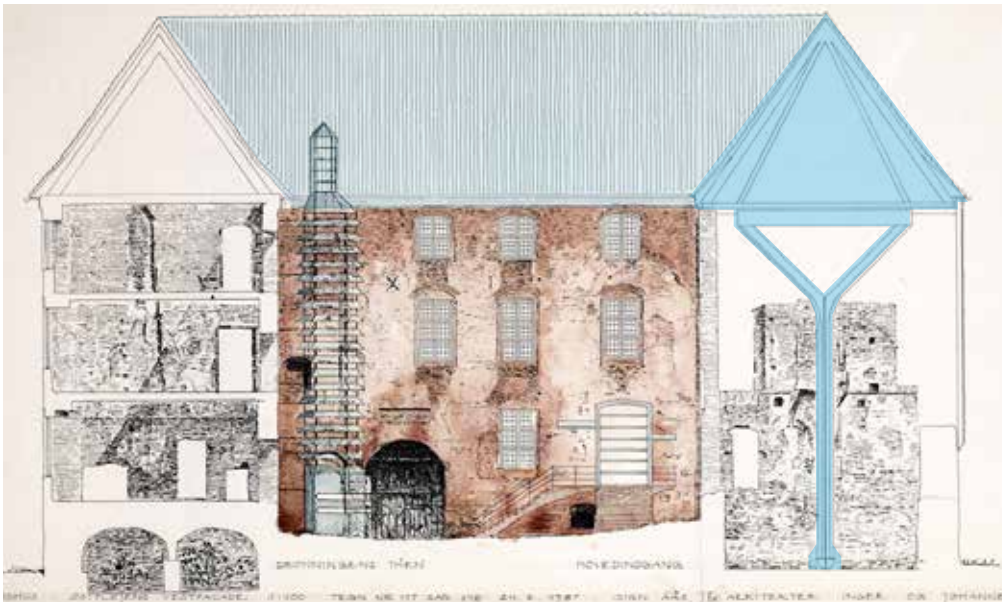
Koldinghus castle renovation by Inger & Johannes Exner, the reconstructed roof and additional column system
